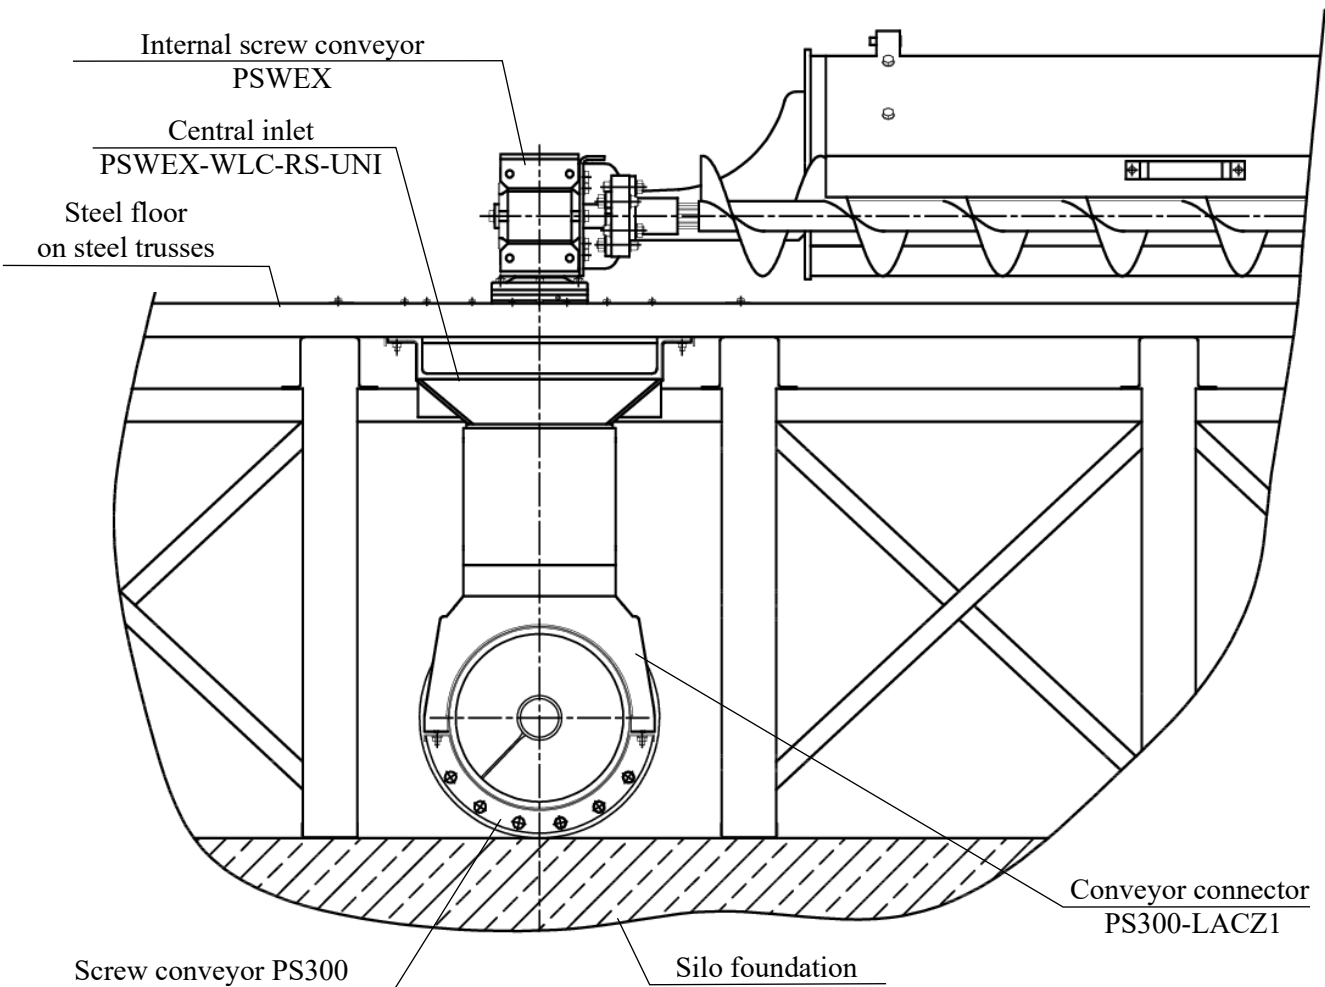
A method for connecting the PS300 conveyor with PSWEX using the connector PS300-LACZ1, a steel floor on steel trusses, and the central inlet PSWEX-WLC-RS-UNI.
